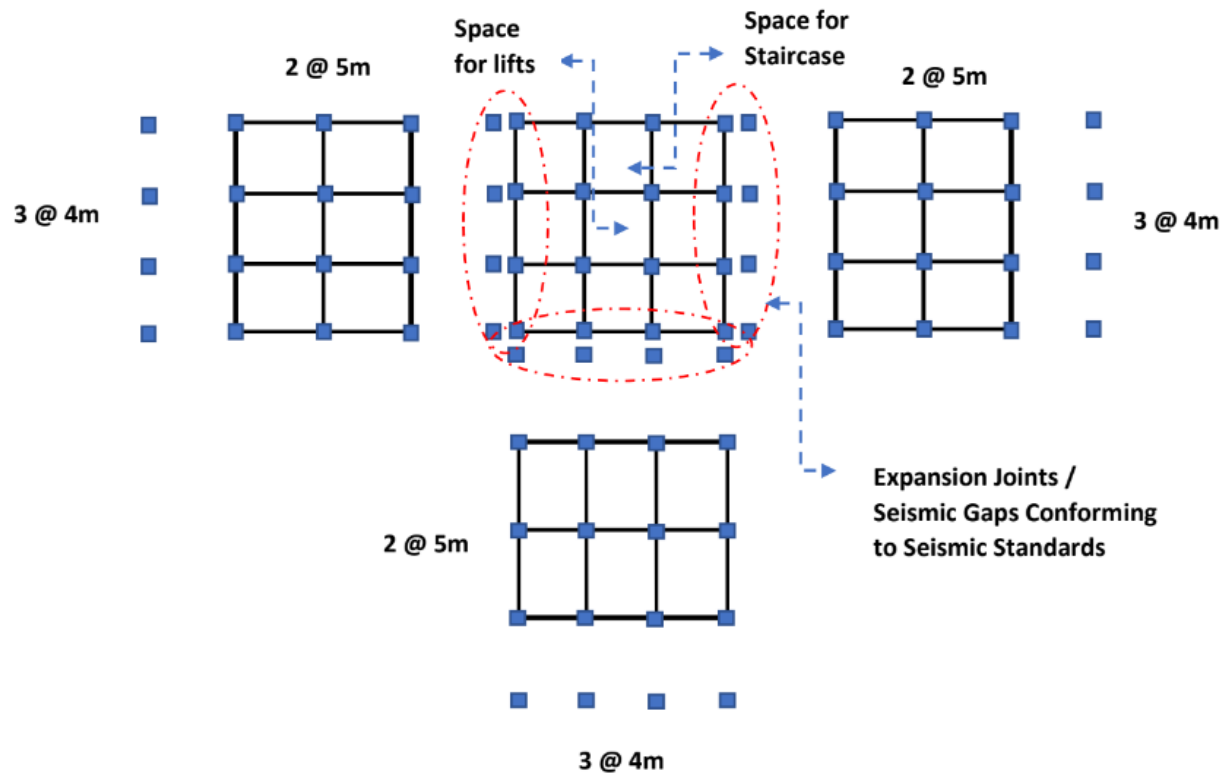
Plan layout of top storey (Dedicated for Amusement Facilities)
